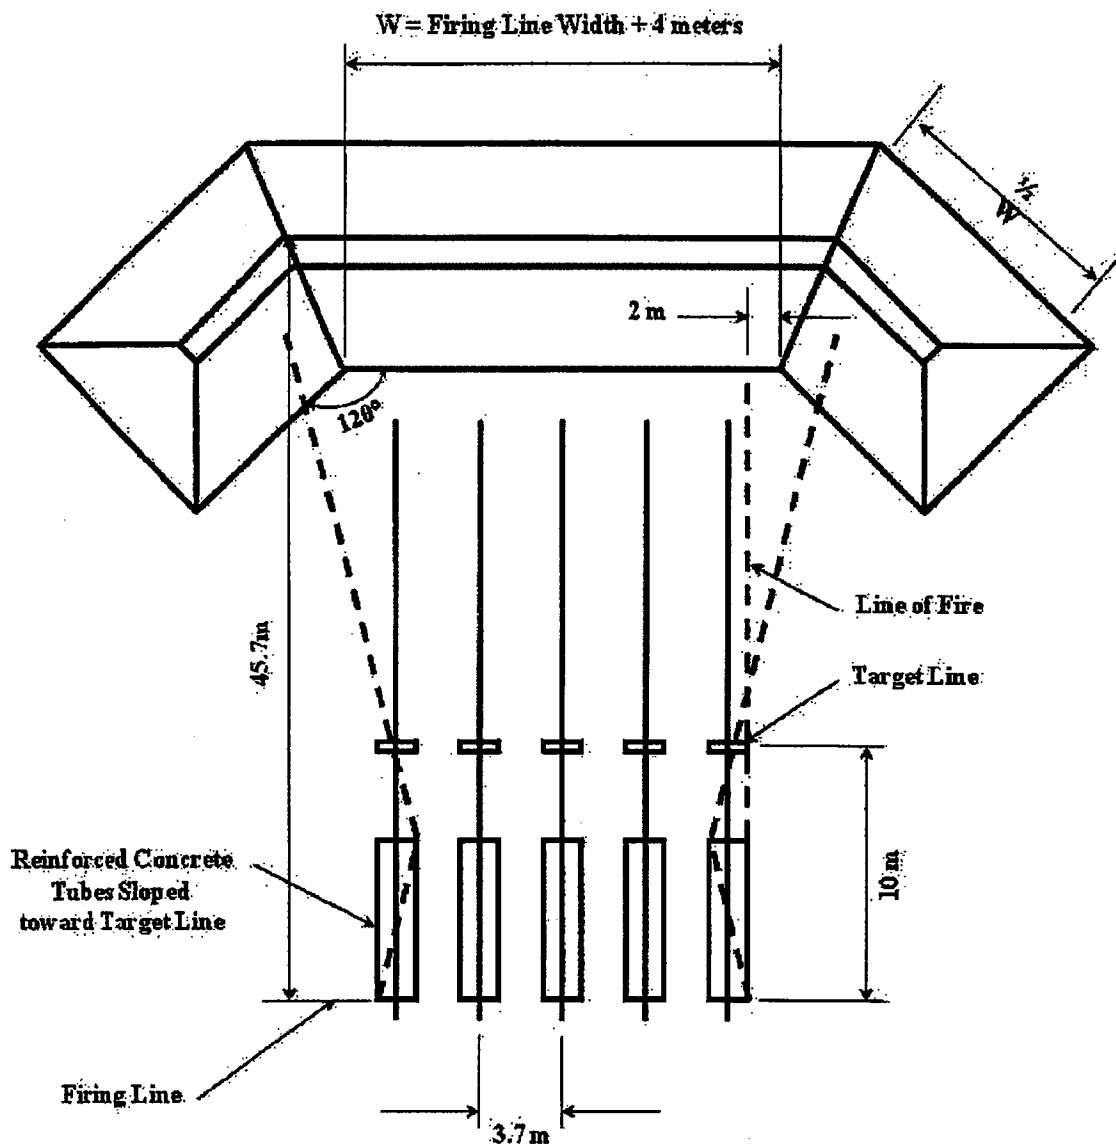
Machine Gun, 10-Meter Tube Range Typical Range Configuration
